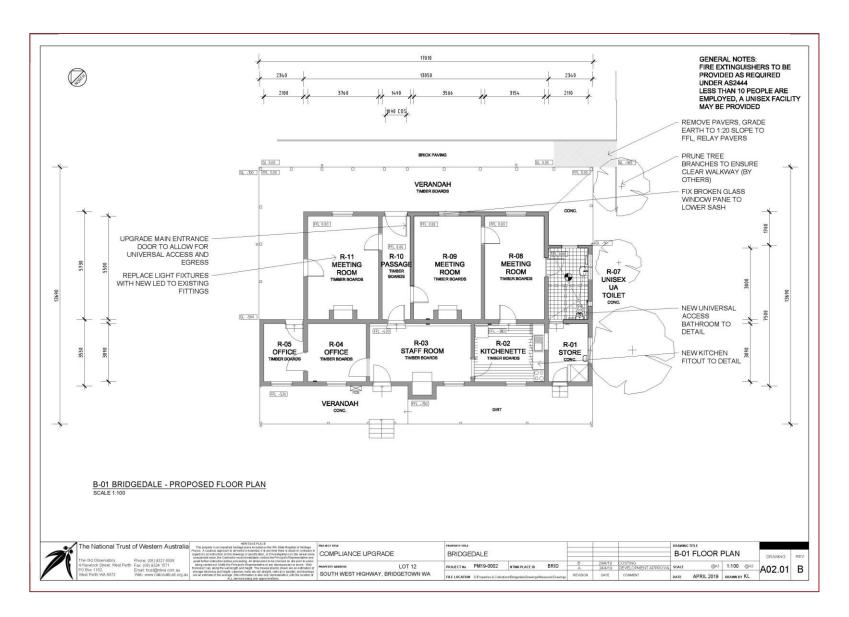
Proposed Floor Plan for Lot 12 South Western Highway, Bridgetown
